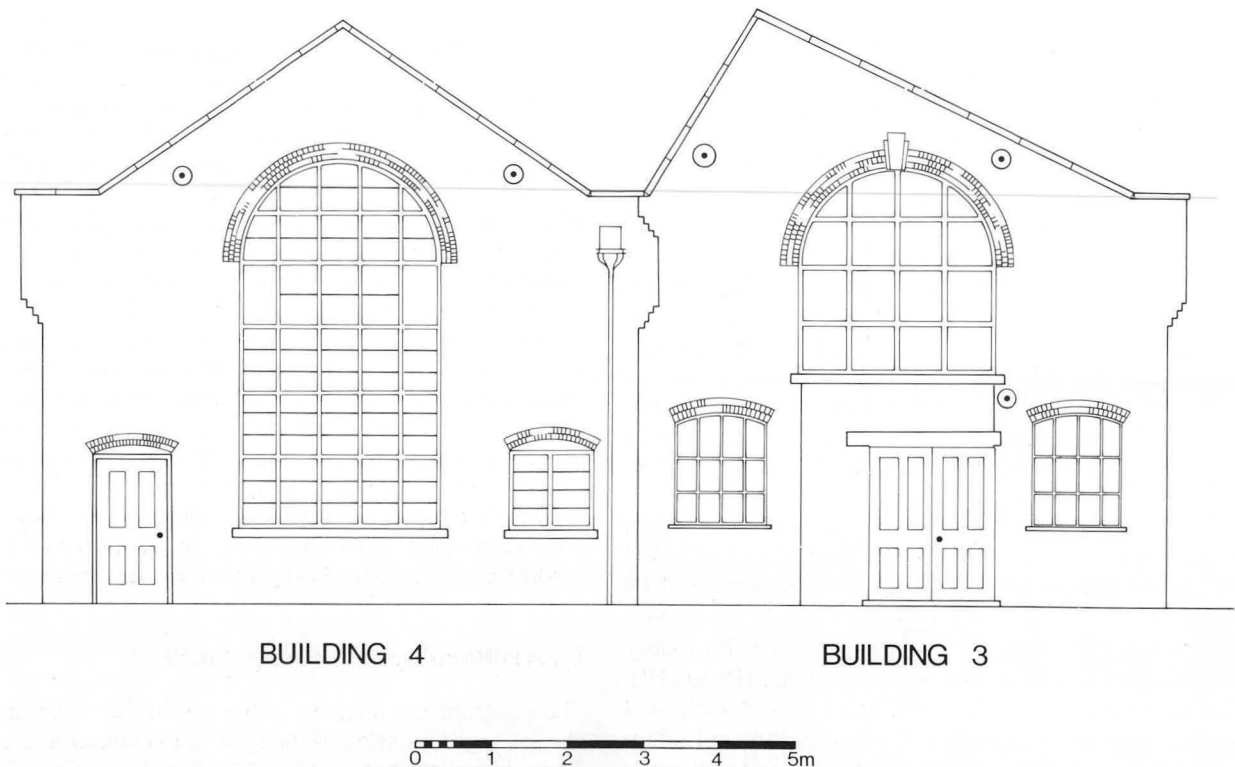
East elevation of industrial buildings 3 and 4. Scale 1:100.
